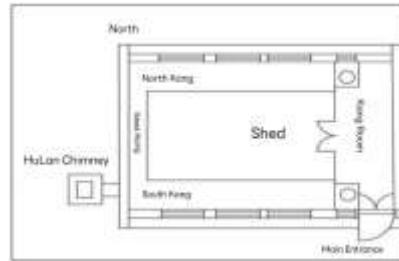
WanZi Kang Floor Plan (Drawn by The Author, 2024)
